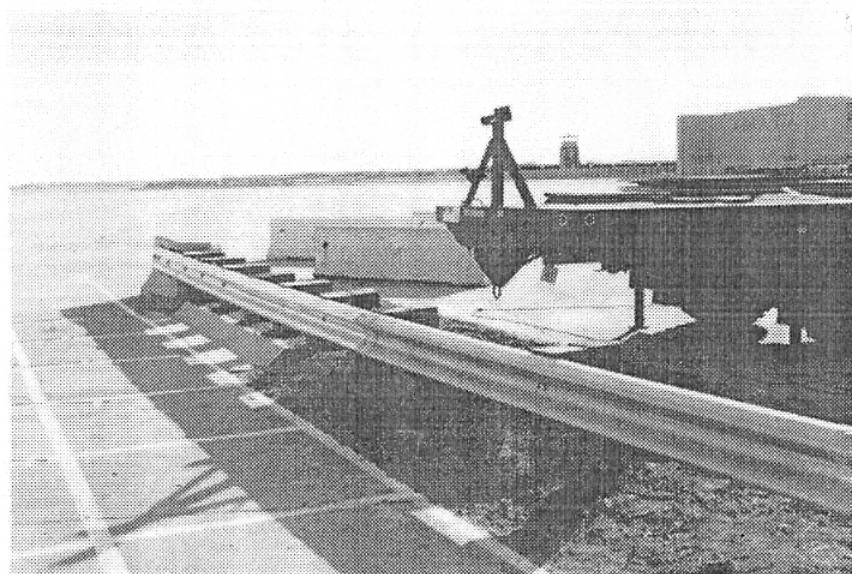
PHOTOGRAPHS OF W-BEAM APPROACH GUARDRAIL INSTALLATION.
